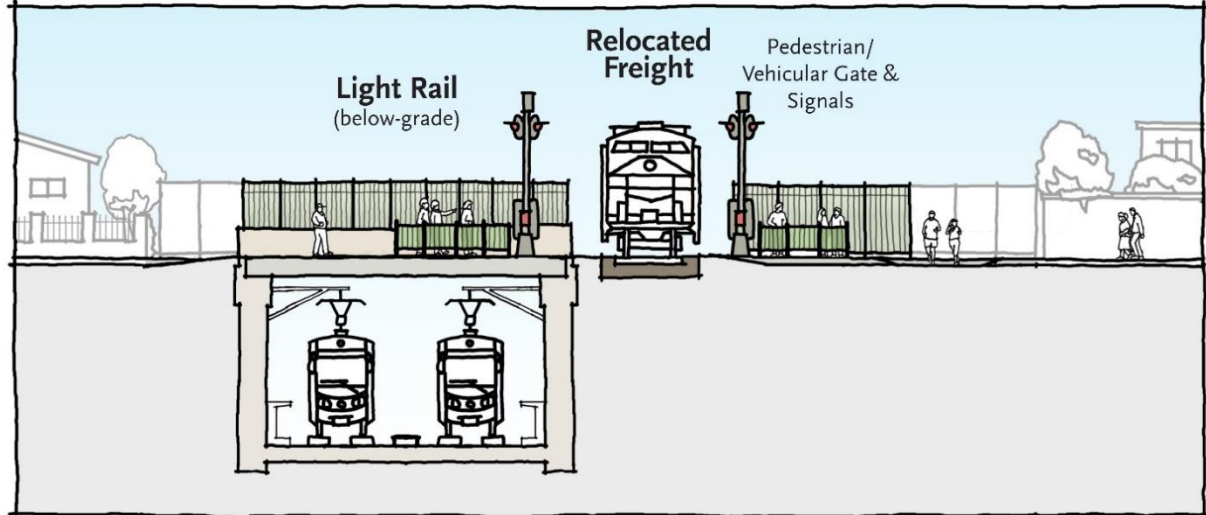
Locally Preferred Alternative – Looking South Between 165th Street and 168th Street
